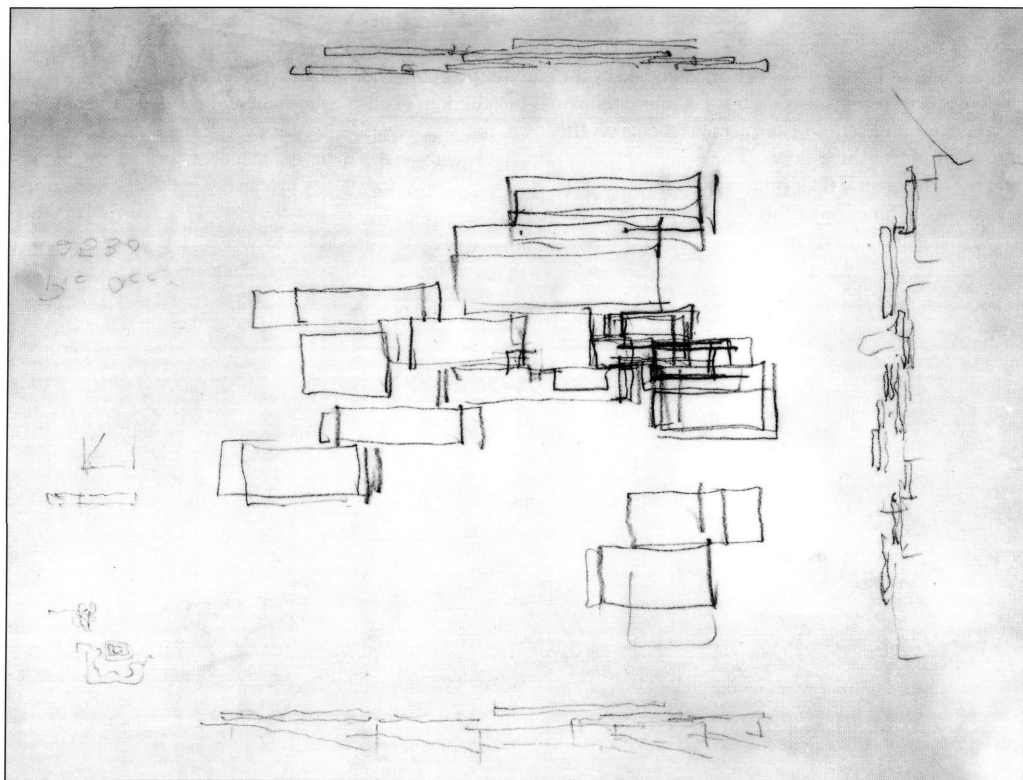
Jorn Utzon, sketch for a proposed house at Bayview, Sydney c.1963 showing plan with sketch elevations on the sides (420 X 390). PXD 492/54
